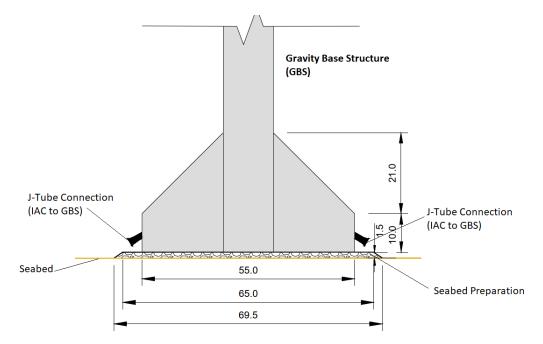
Cross section of the GBS foundation to be used for the Project
